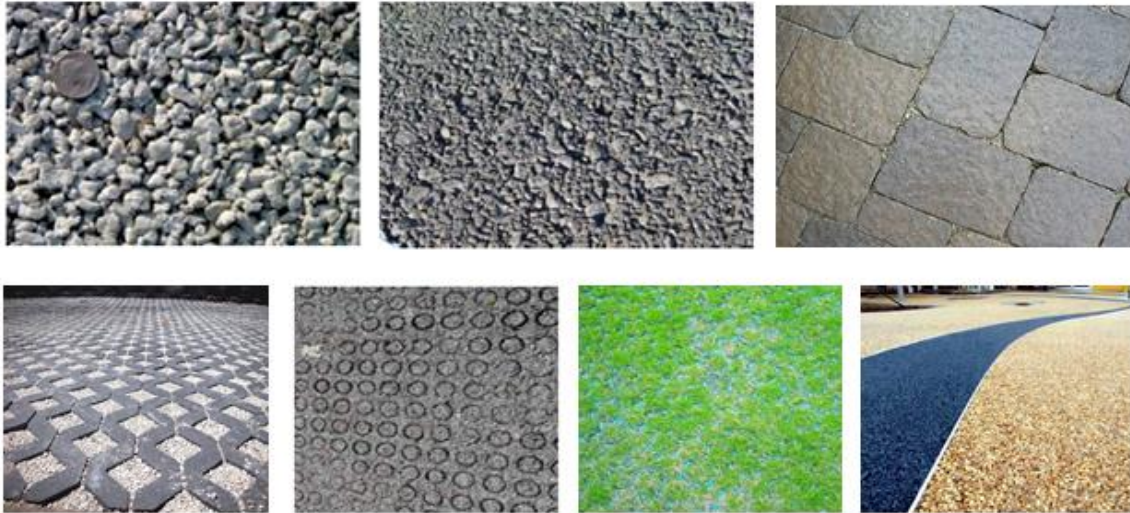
Types of permeable pavement. Top L-R: Permeable concrete (PC), permeable asphalt (PA), permeable interlocking concrete pavers (PICP). Bottom L-R: concrete grid pavers (CGP), plastic reinforcing grids (PG) filled with gravel, PG filled with grass, and bound recycled glass porous pavement.
